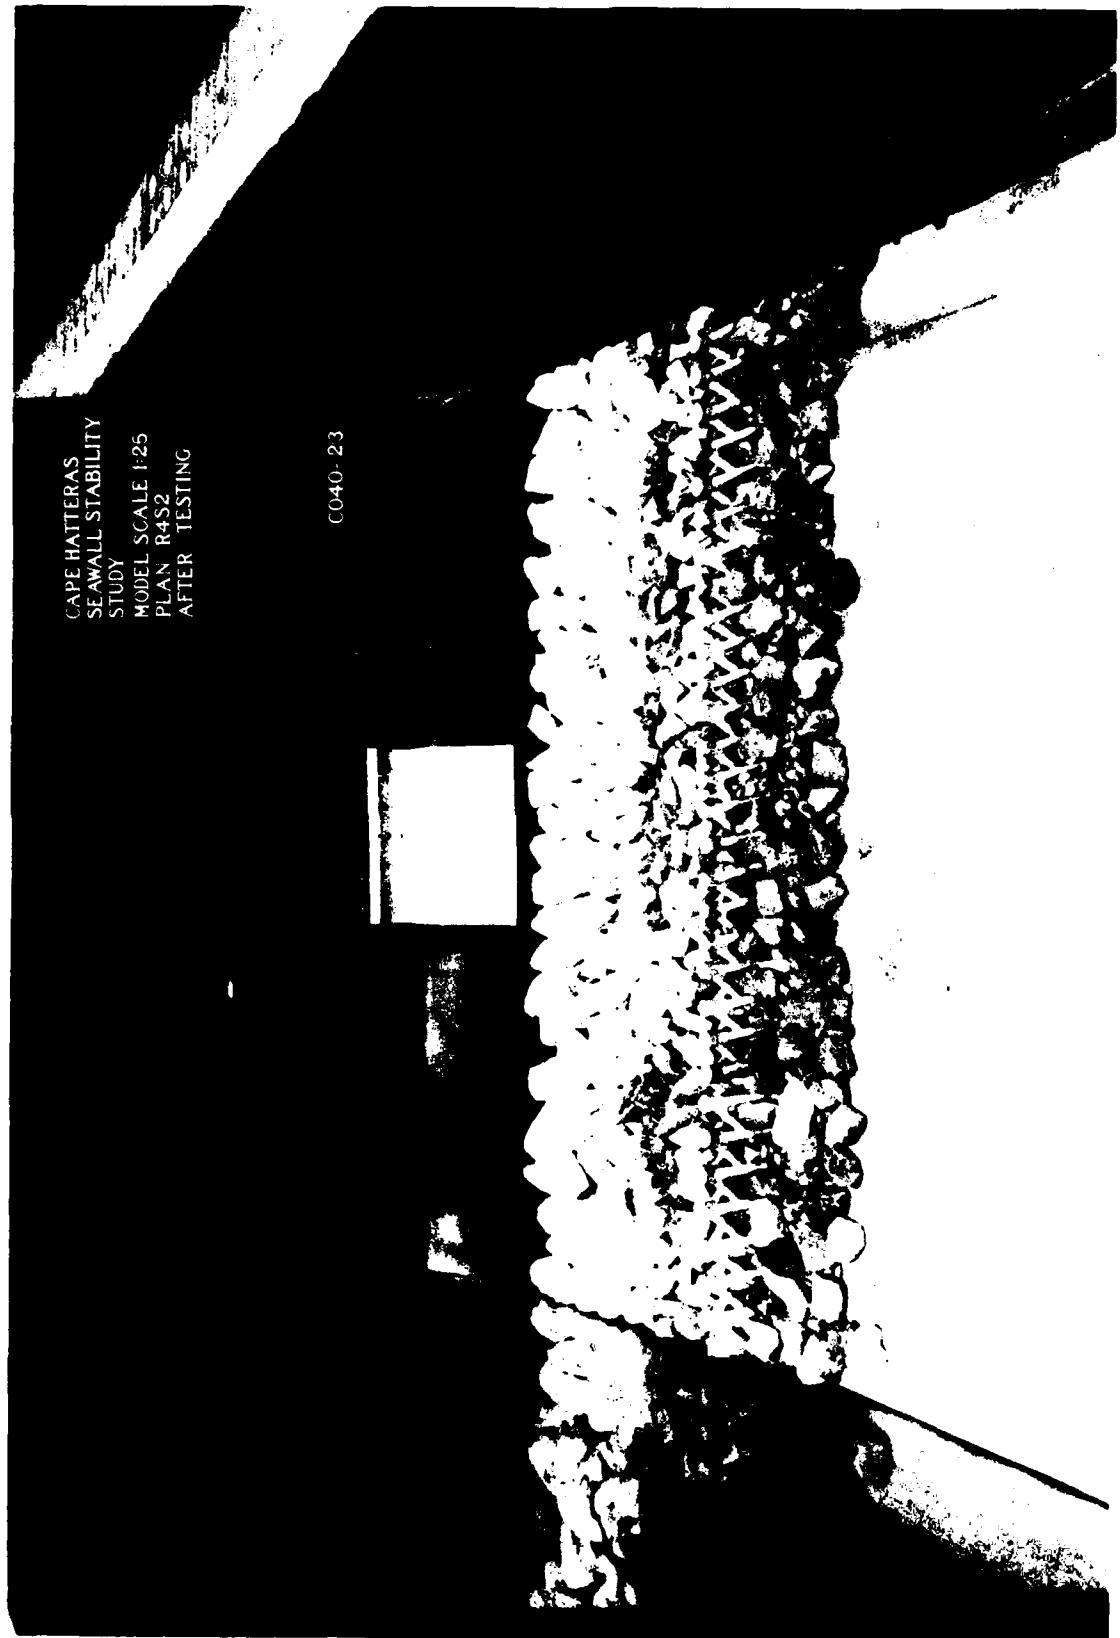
Sea-side view of Plan R4S2 after testing with the abbreviated storm-surge hydrograph
